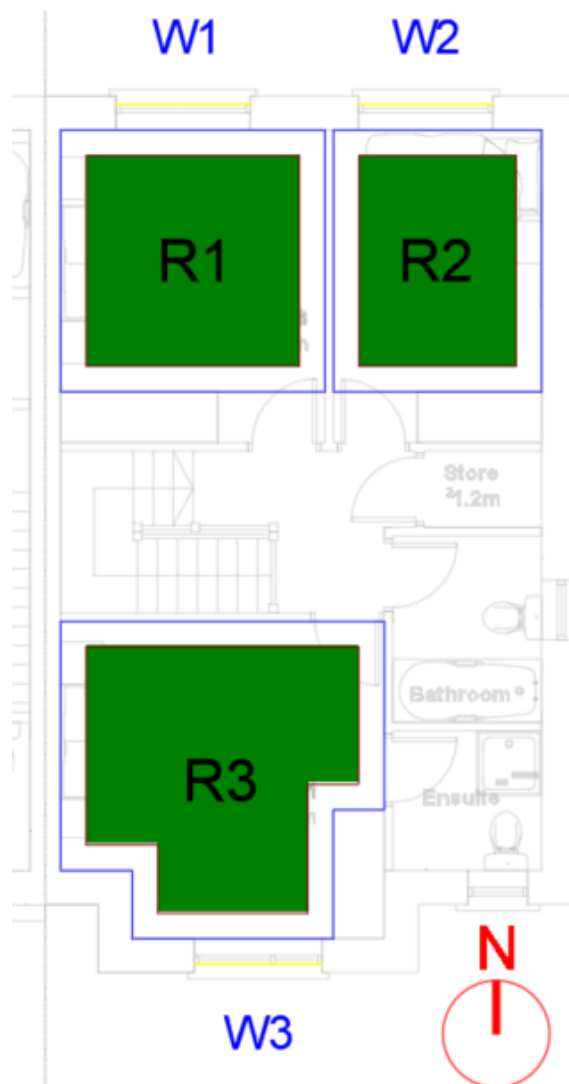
Proposed First Floor sDA Contours of House D-02 2-072
